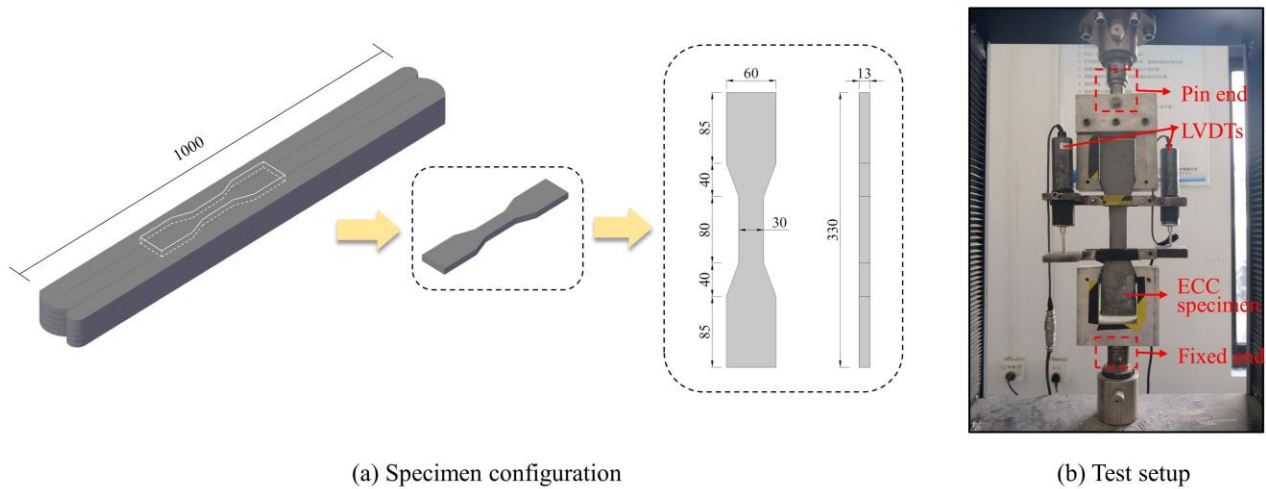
Tensile specimen and test setup (Unit: mm).
